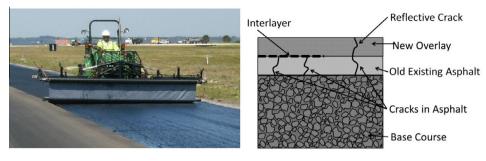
Geosynthetic interlayer and HMA pavement construction.
